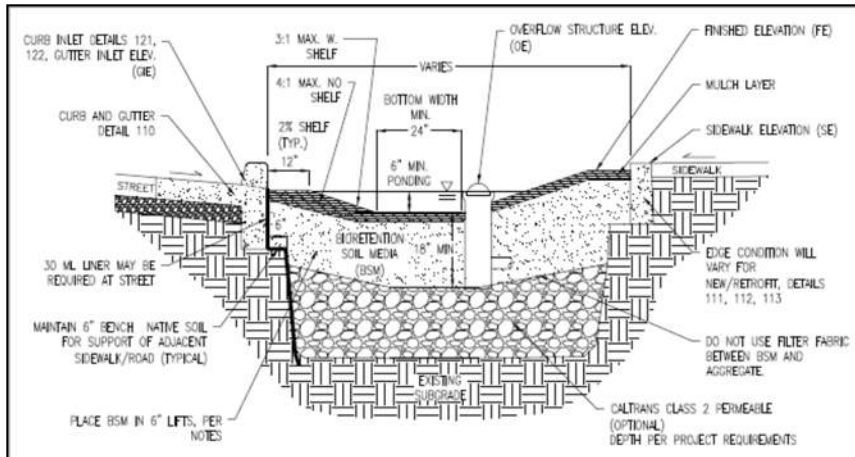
Street Bioretention Facility (sloped sided, without underdrain)
